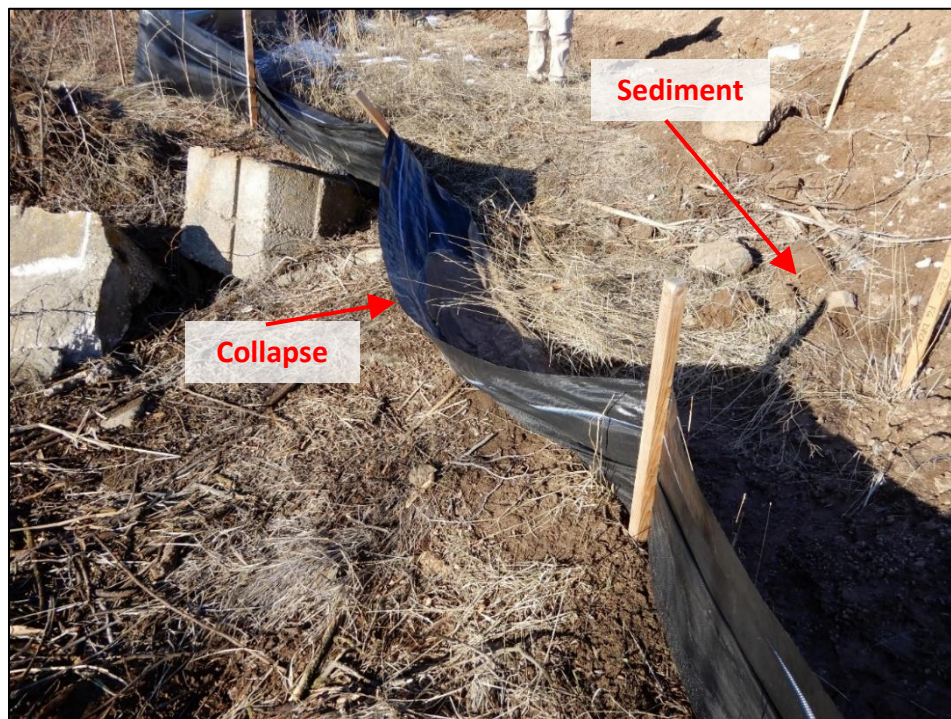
View, facing south, of a section of the silt fence along the Site's southern perimeter. Note the deterioration. The silt fence is located east of Photograph 8.
